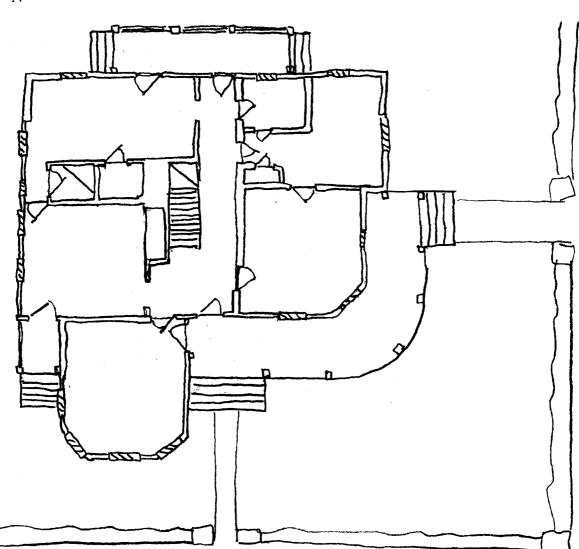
Sketch Floor Plan, Huhn-Harrison House, First Floor
